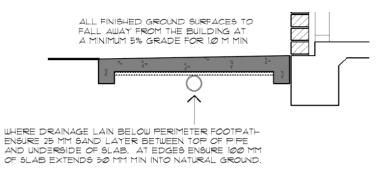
SECTION SHOWING LOCATION OF DRAINAGE BELOW CONCRETE PATH
